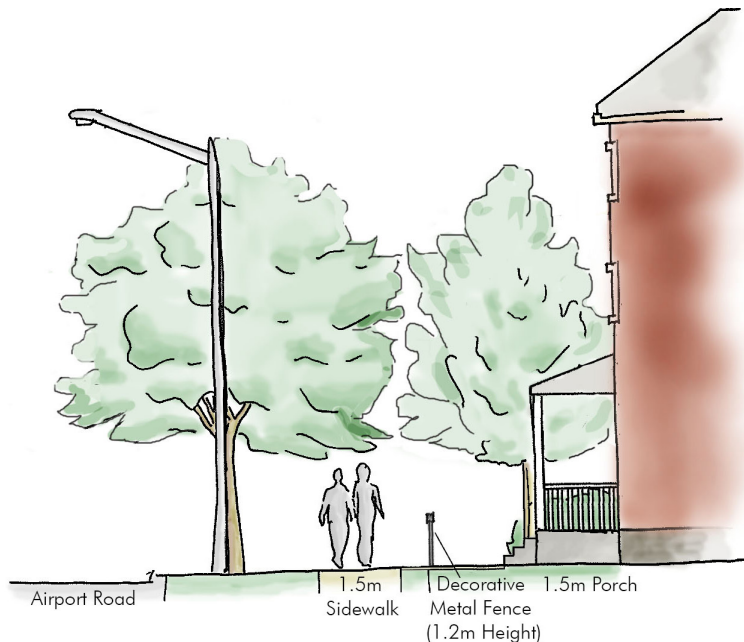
Streetscape Treatment Between Airport Road and Proposed Built Form
